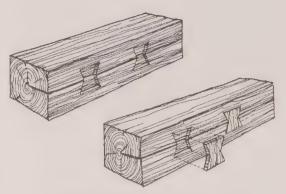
Clamps or wedges are a traditional method of preventing the spread of cracks.
